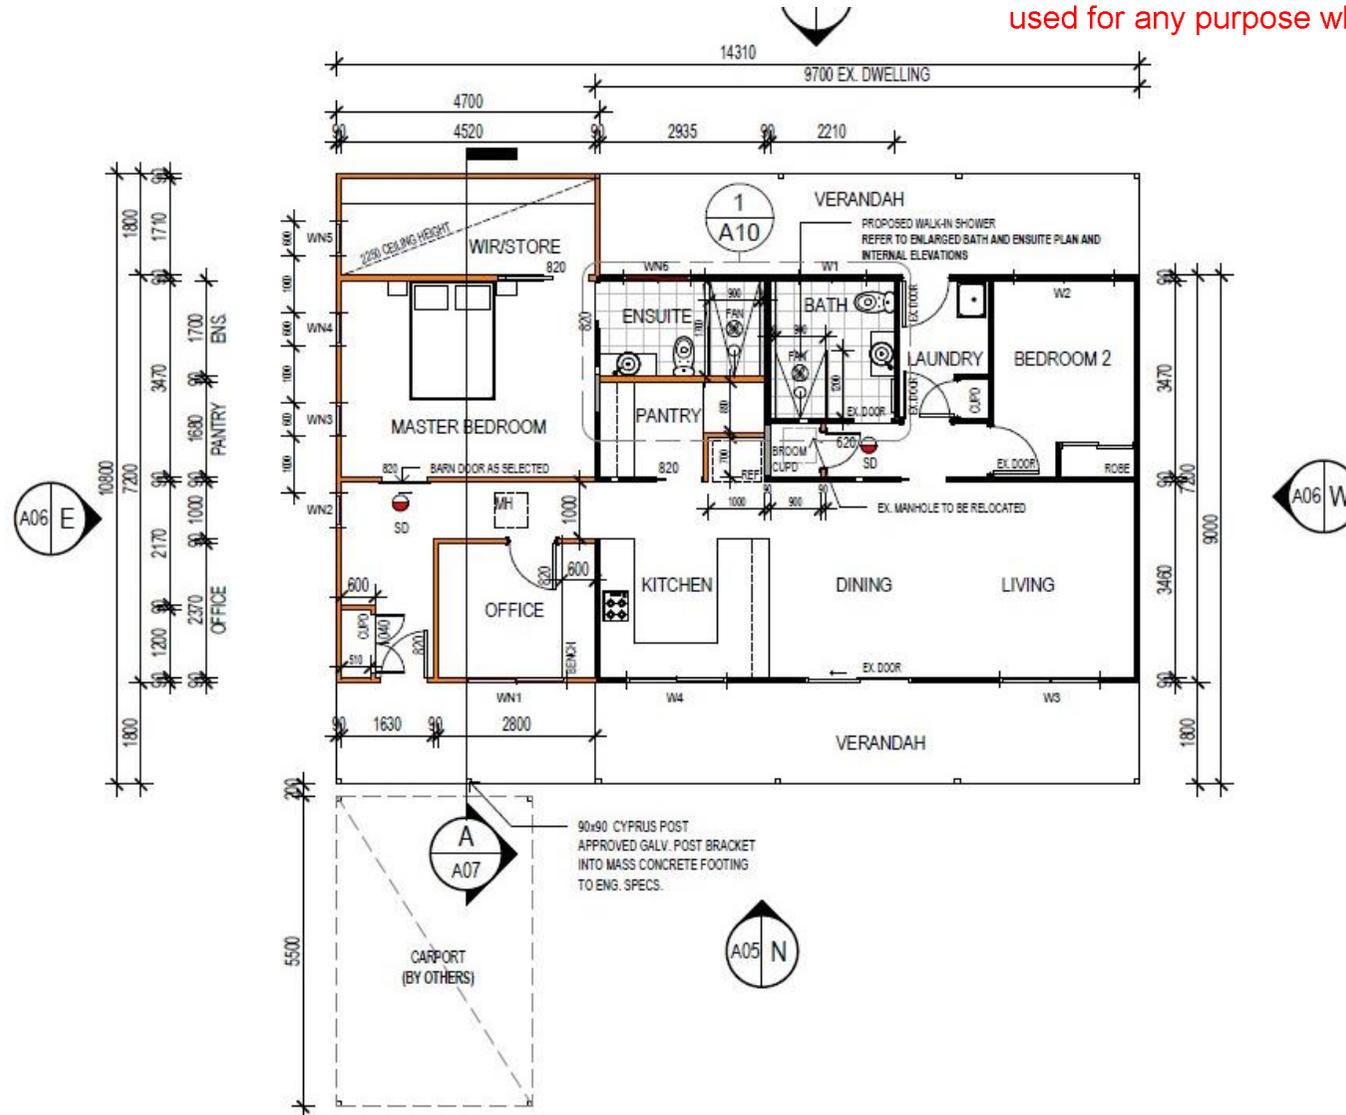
Proposed Floor Plan – A1 Building Design and Drafting
